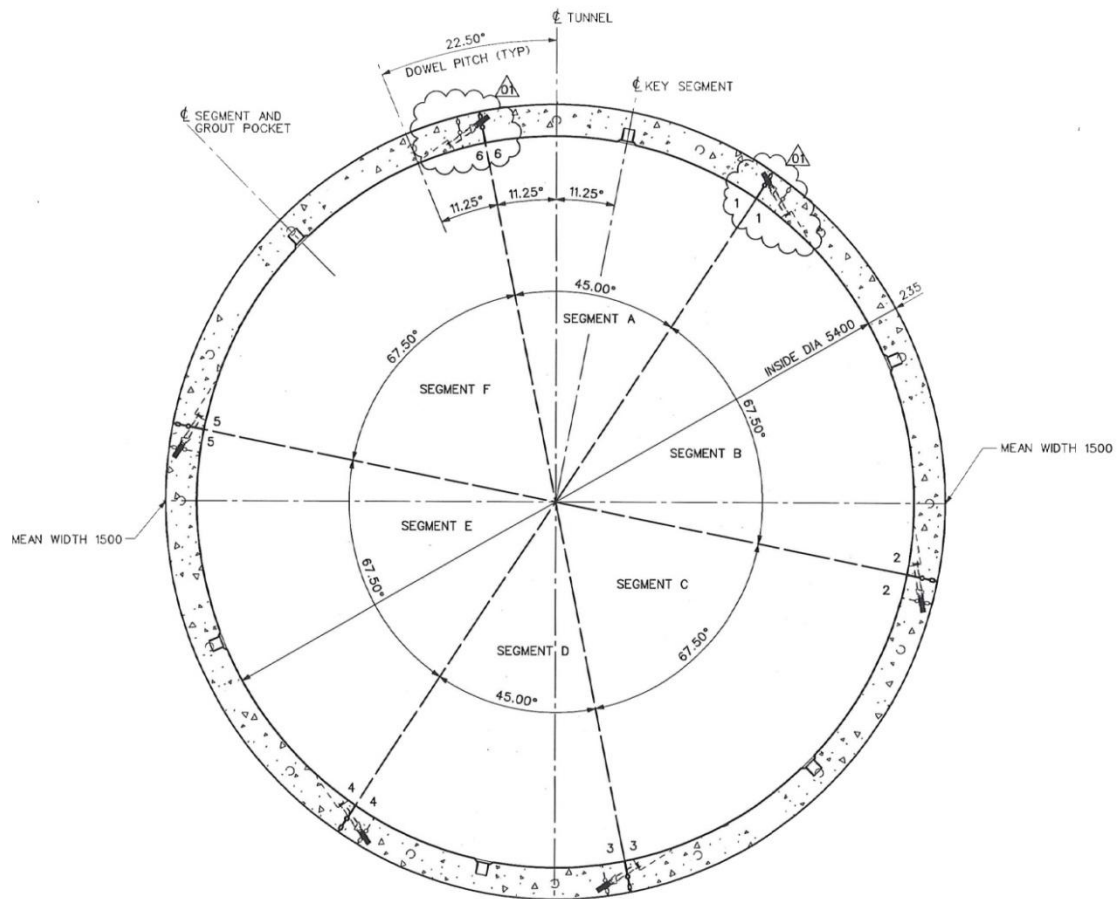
Detail drawing of segment tunnel lining (HMM)
